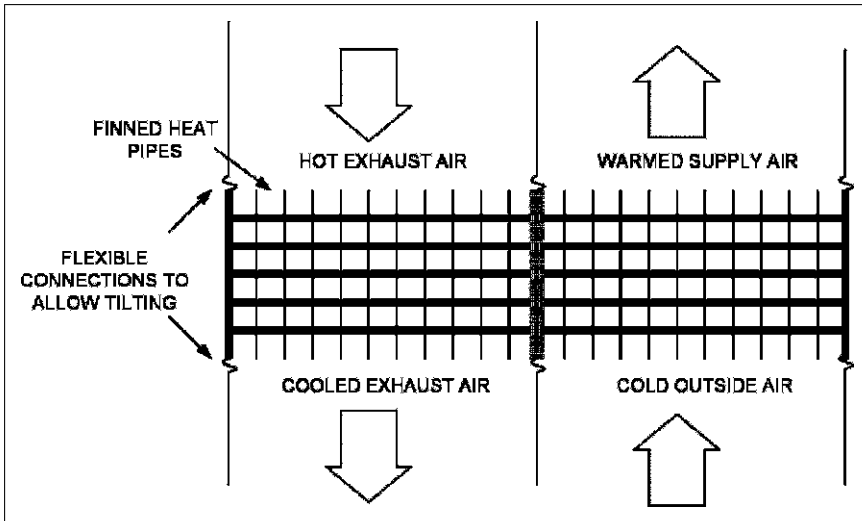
Heat Pipe Assembly in Exhaust and Outside Air Entry
